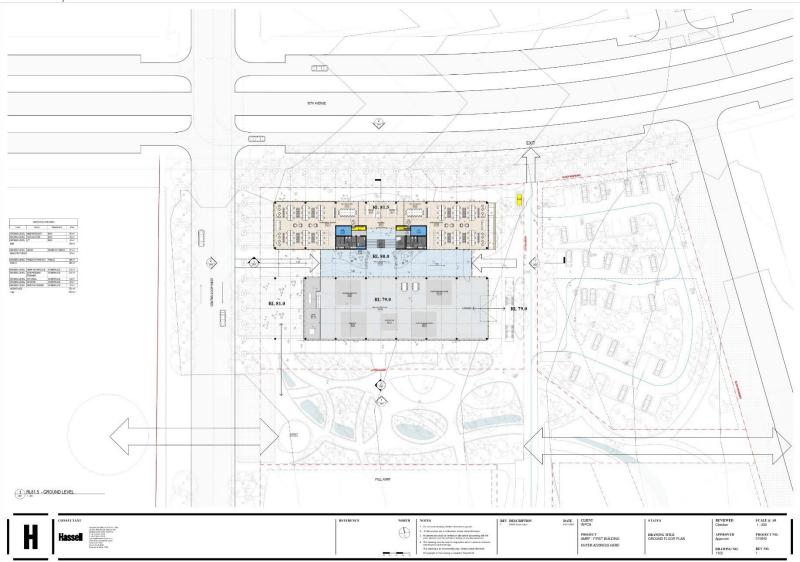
AMRF – First Building ground floor plan (Architectural drawings prepared by Hassell, 2021).
